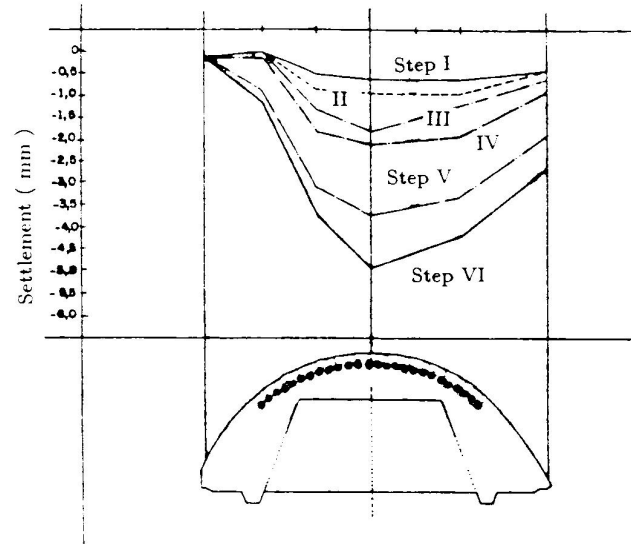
Execution Steps and Monitored Surface Settlements (Horizontal Jet Grouting Pre Supported Section)
